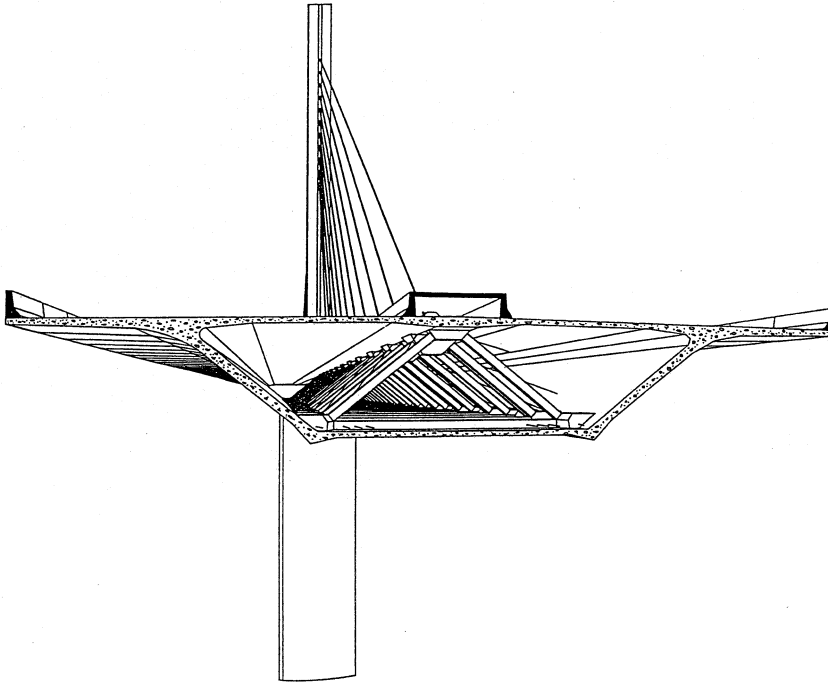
Sunshine Skyway Bridge — isometric view.
